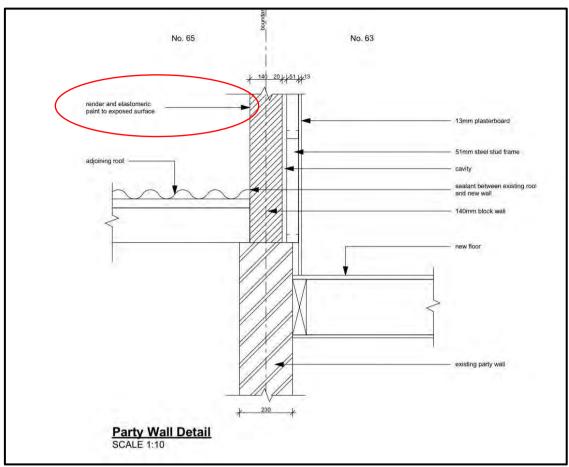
Party wall detail showing works over the property boundary (between No. 65 and 63 Victoria Street
